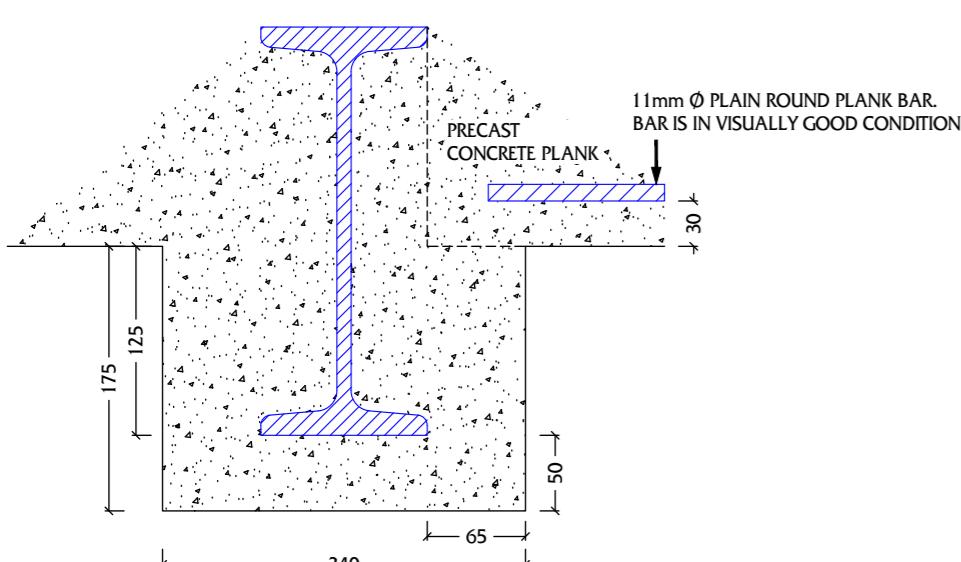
PART SECTION LOOKING WEST THROUGH 1ST FLOOR PRIMARY BEAM - SURVEY AREA K/10-11 SCALE 1:5
